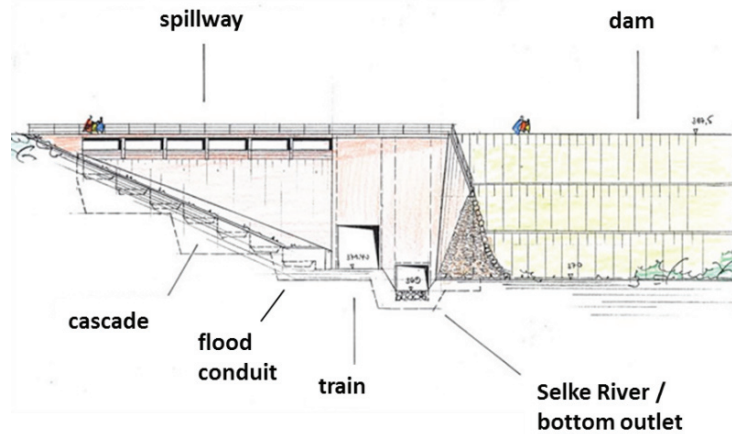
View on the dam of the flood protection reservoir Straßberg (Source: BCE/TSB)
